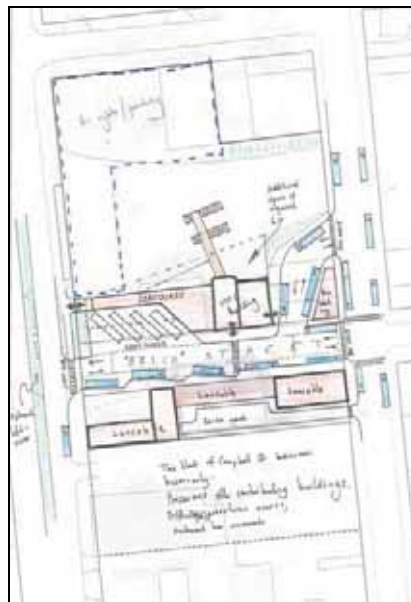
FF (shown below) is the best achievable solution if all the contributing structures are to be preserved. Bus-to-bus transfers are made as convenient as practicable, but only nine off-street Wave bays can be accommodated. The brick pavement is sacrificed, and is replaced with a brick-effect surface that is suitable for buses. Campbell Street retains in part the ‘look and feel’ of a street.
